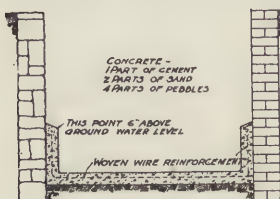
Method of Waterproofing Old Cellars of Brick or Stone.
